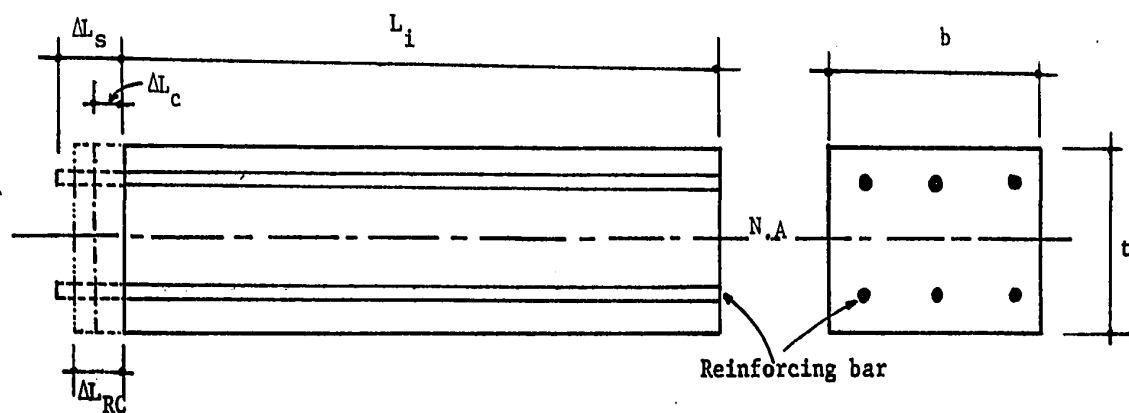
SYMMETRICALLY REINFORCED CONCRETE SLAB
